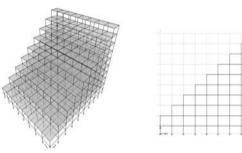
3-D View and Elevation of Setback building for Storey 9(0°Slope)
